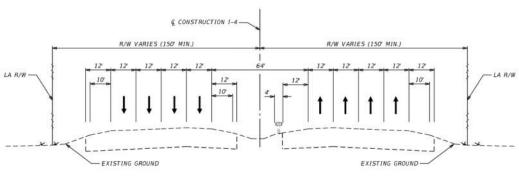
Existing Typical Section (E. of SR 535, Sta. 1199+00.00 to E. of Central Florida Pkwy, Sta. 1345+48.48)
